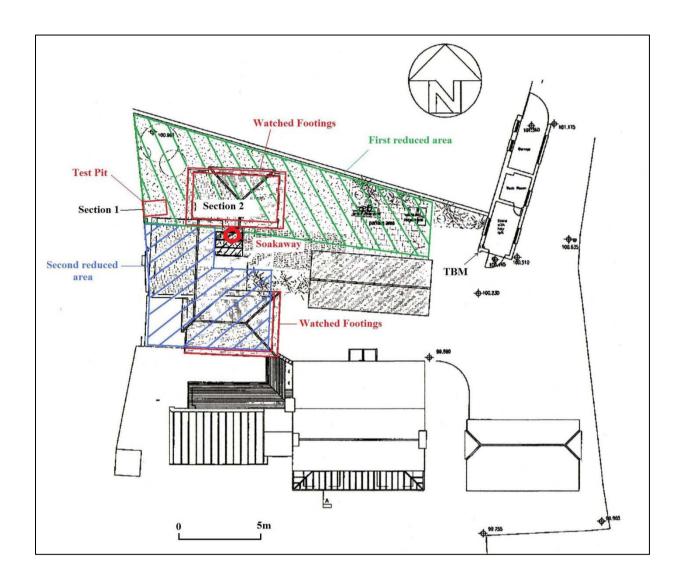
Baldwins, Keymer, West Sussex: Site Plan
